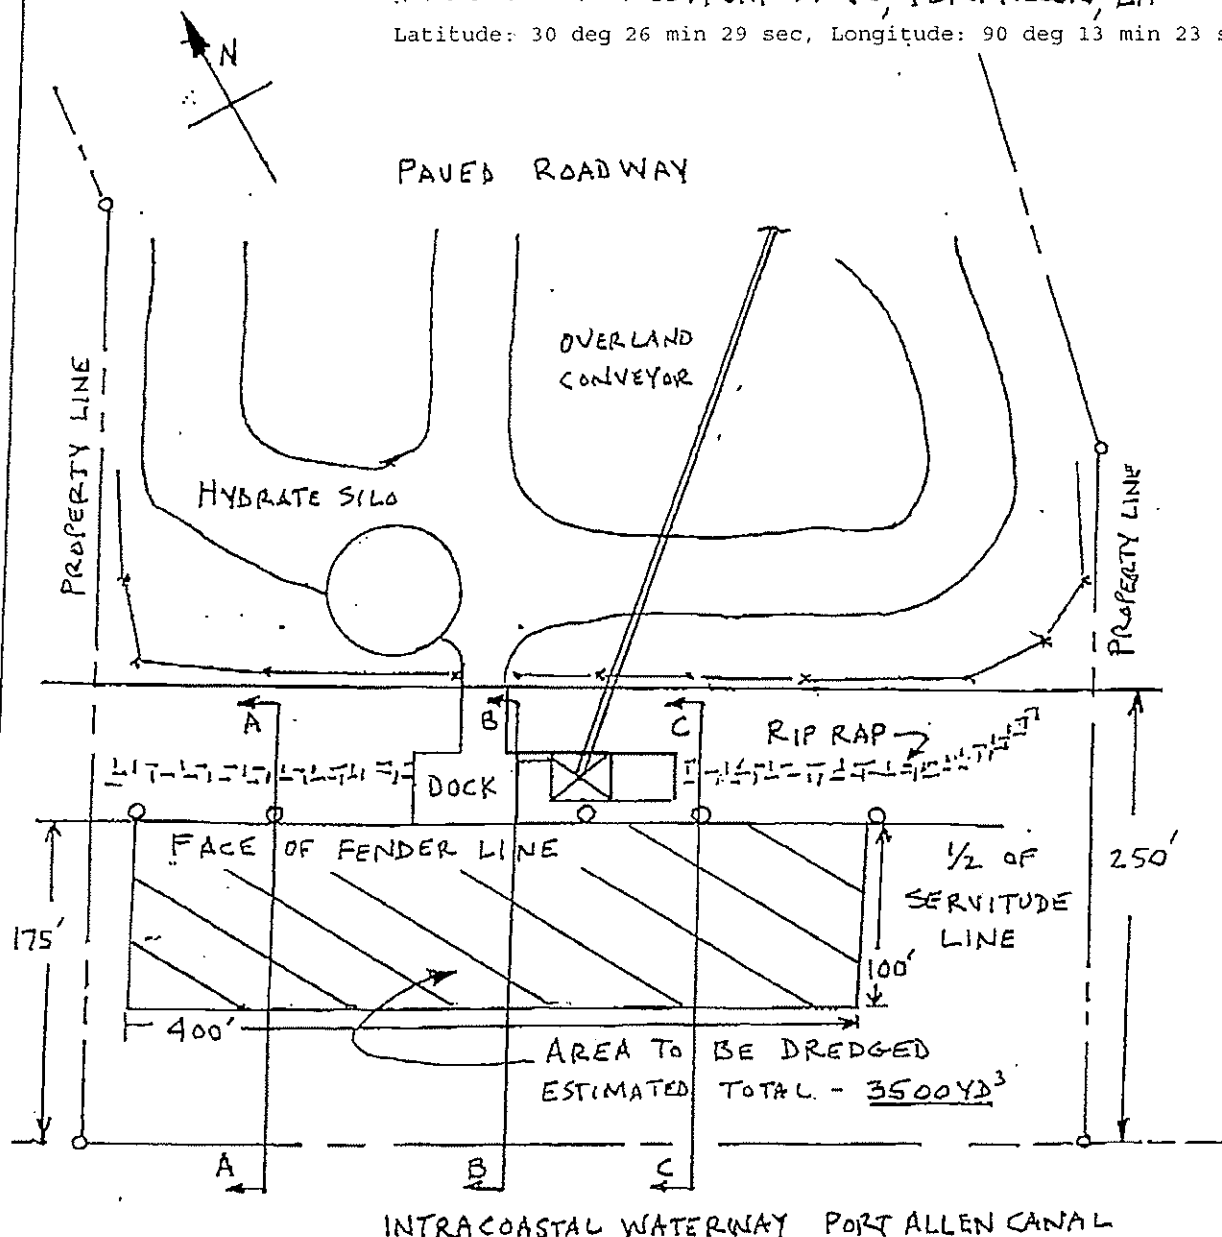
Plan View of Planned Dredging Area adjacent to Lhoist Unloading Dock
